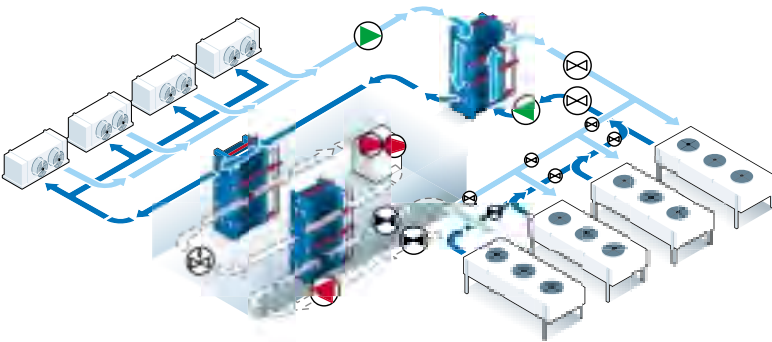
Winter case: bypassing the chiller provides full free cooling.
